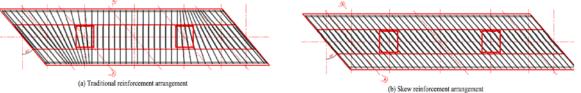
Skewed ITBC reinforcement arrangements (Plan view) [16]
